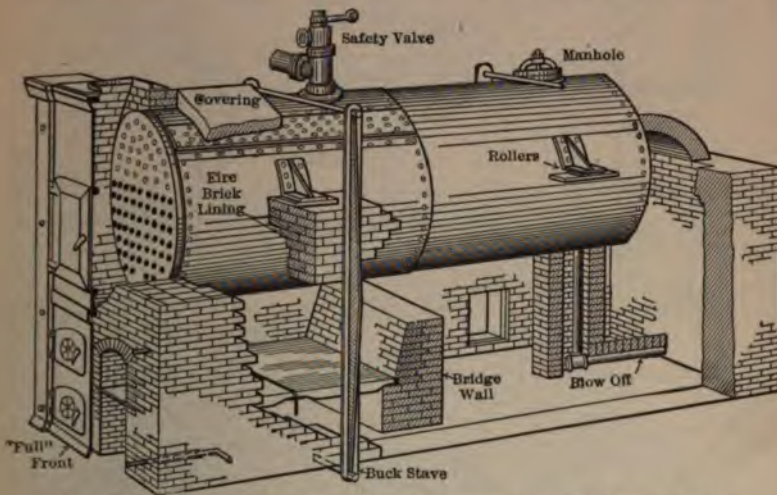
Horizontal Return Tubular Boiler with "Full Flush Front."
